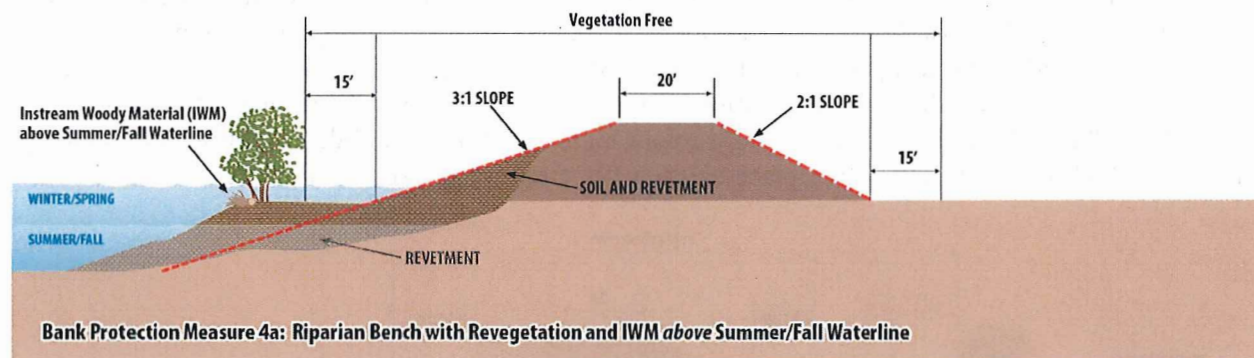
Bank Protection Measure 4a: Riparian Bench with Revegetation and Instream Woody Material above Summer/Fall Waterline
